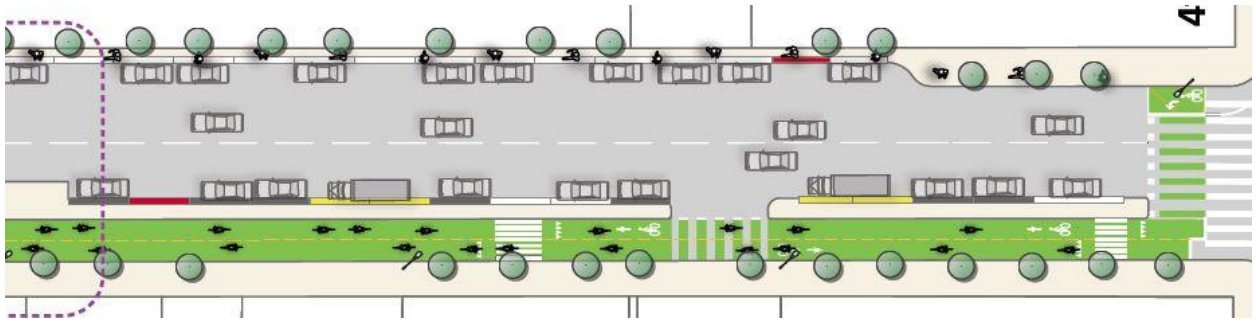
Typical Plan View of Howard Street between midblock between 5th and 4th and 4th Street
